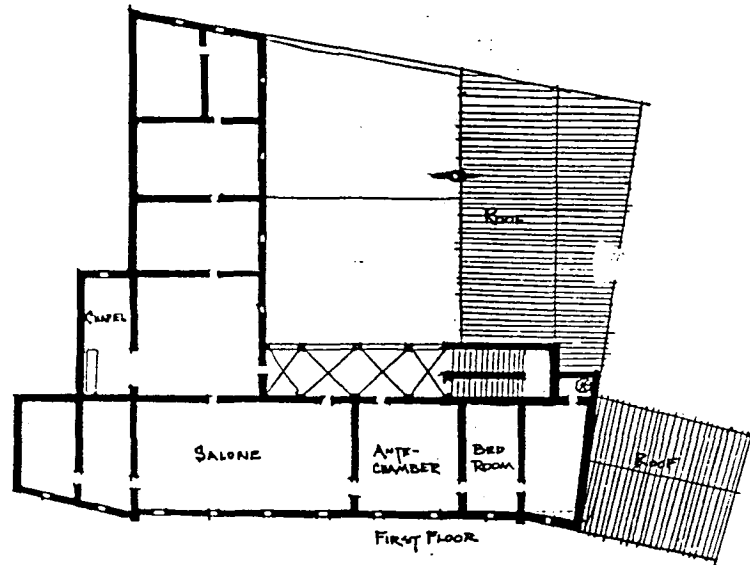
Palazzo Ricci: plans as built (from Andres)
